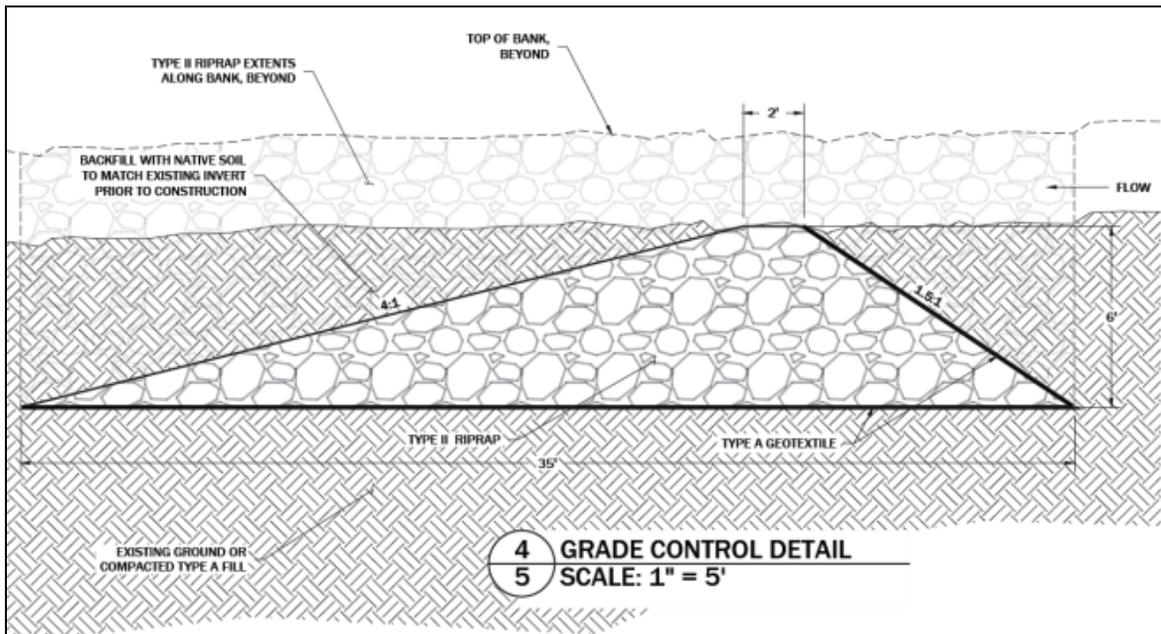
Schematic cross-section of the proposed South Channel grade control structure.
